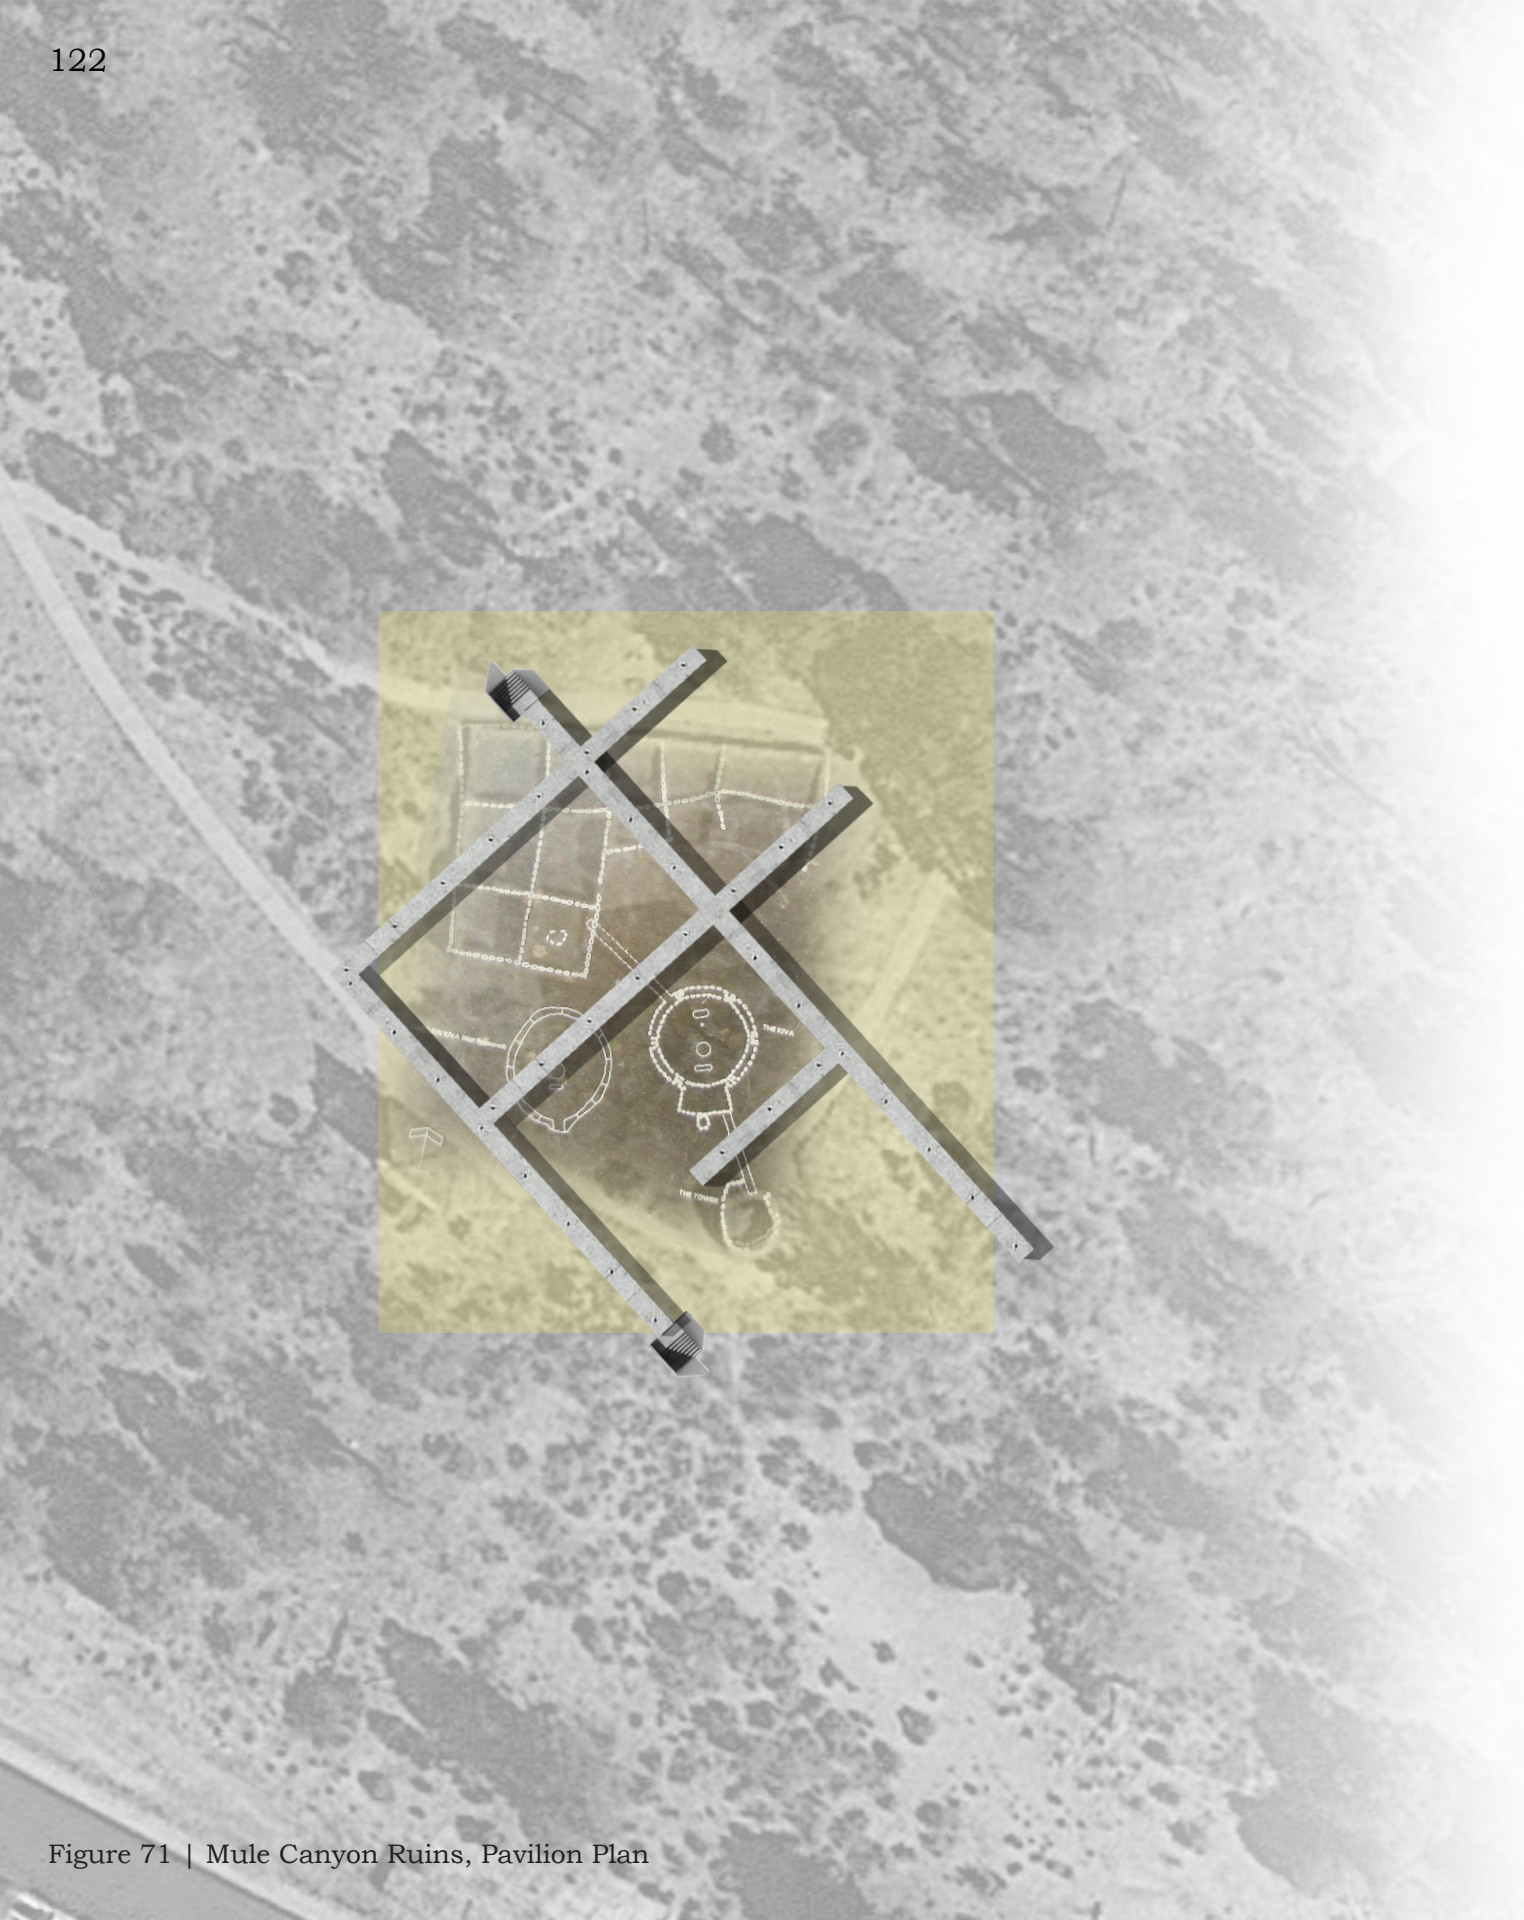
| Mule Canyon Ruins, Pavilion Plan
